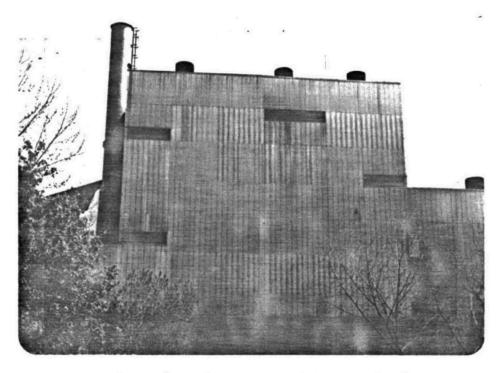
View from ground level facing east showing boiler stack and the west end of the plant.
